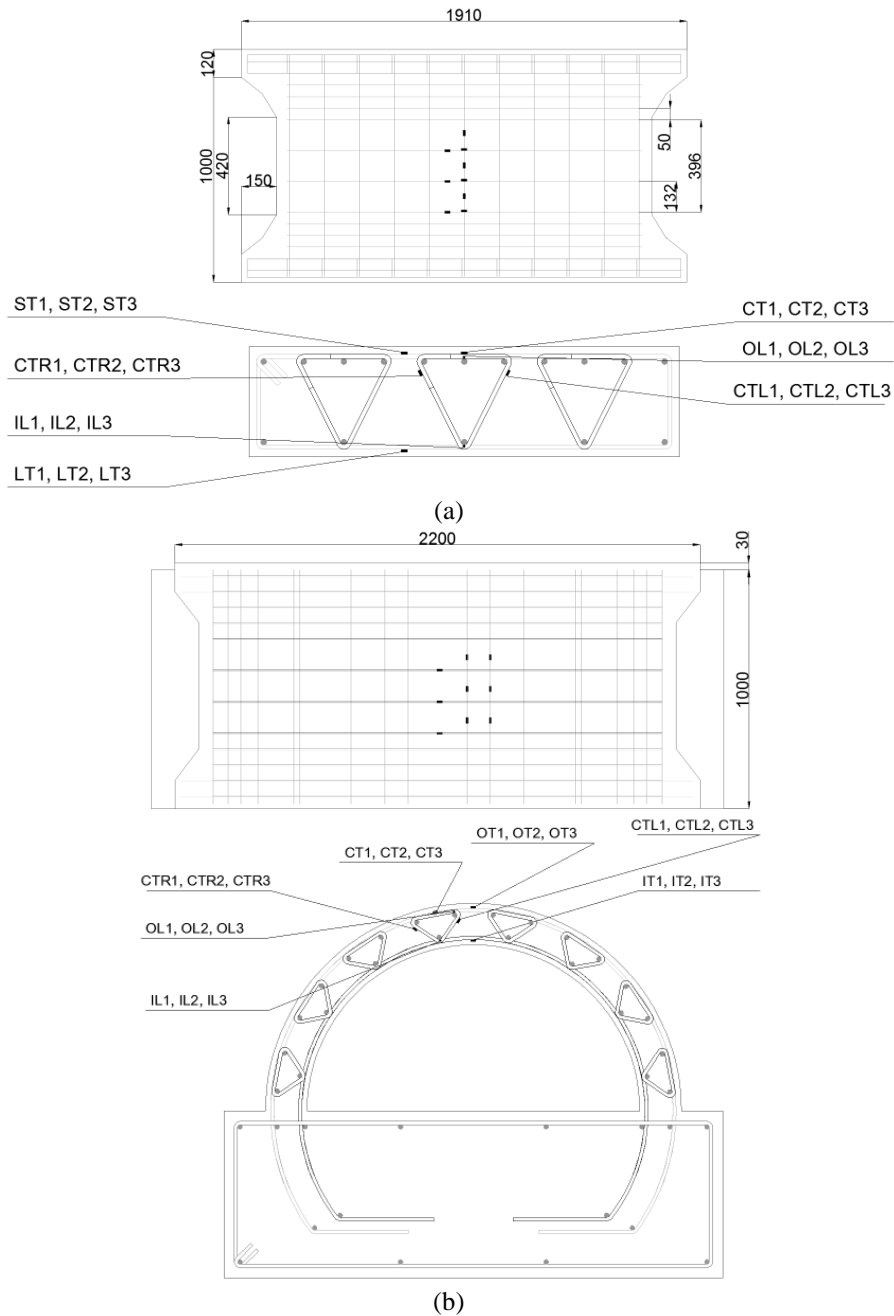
Instrumentation of the test specimen (Unit: mm): (a) rectangular section; and (b) circular section
